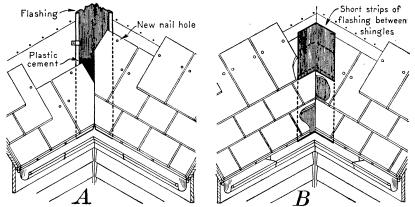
Closed valley flashings: A, Long sheets under shingles; B, short pieces intermembered with shingles.
